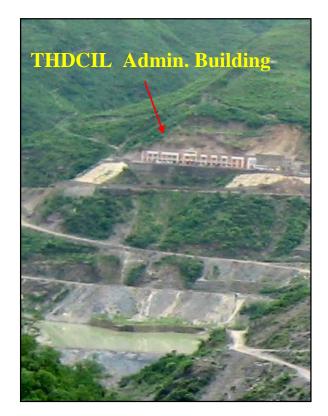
A View of Slope RBS15 located 14.5 km d/s of Zero Bridge (near THDCIL Administrative Building, Pendars village)
